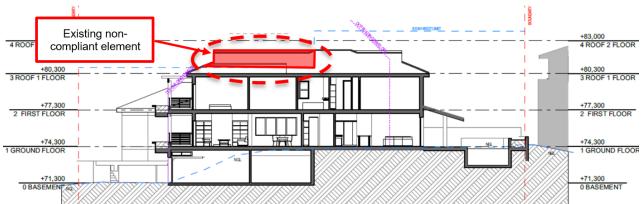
Section illustrating the existing non-compliance with the Height of buildings development standard (Source: CI 4.6 Request prepared by The Planning Studio under the original DA)
